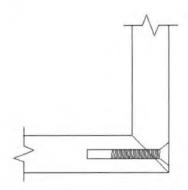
Fastener ¼ - 20 HWH Tek at the guard corners
